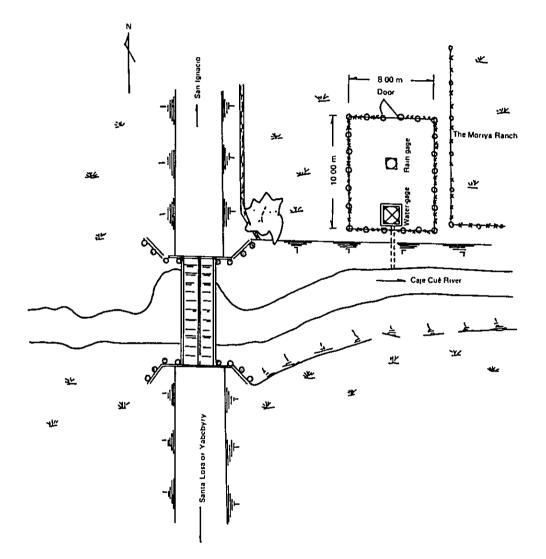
Location of Water Gage Installation at the Caje Cué River
